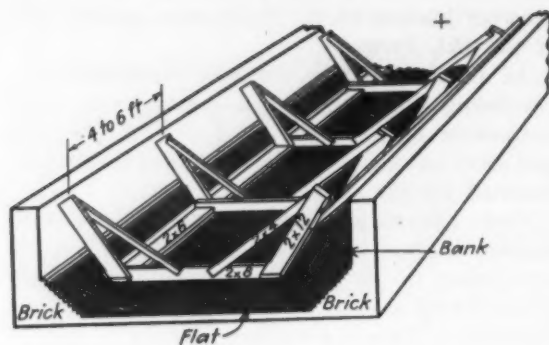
A schematic drawing of wooden frames erected on flat or ramming of banks. Note board sizes, spacing.
